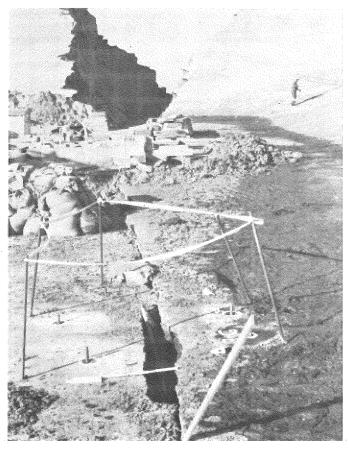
Lining separation and straddler points set after failure, December 28, 1963.
